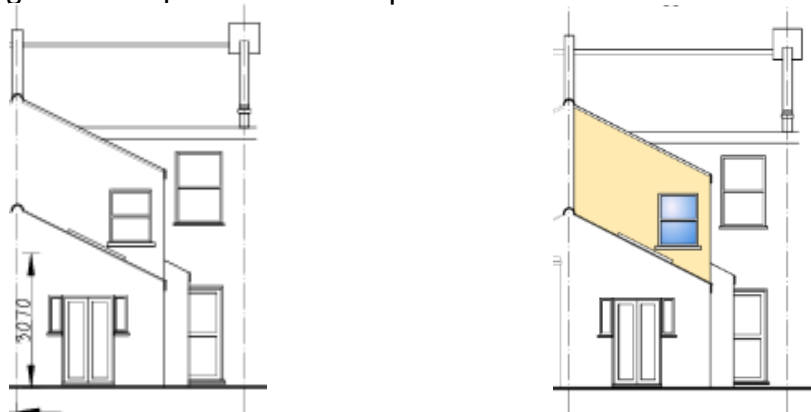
Existing elevation plan (left) and proposed elevation plan (right)
